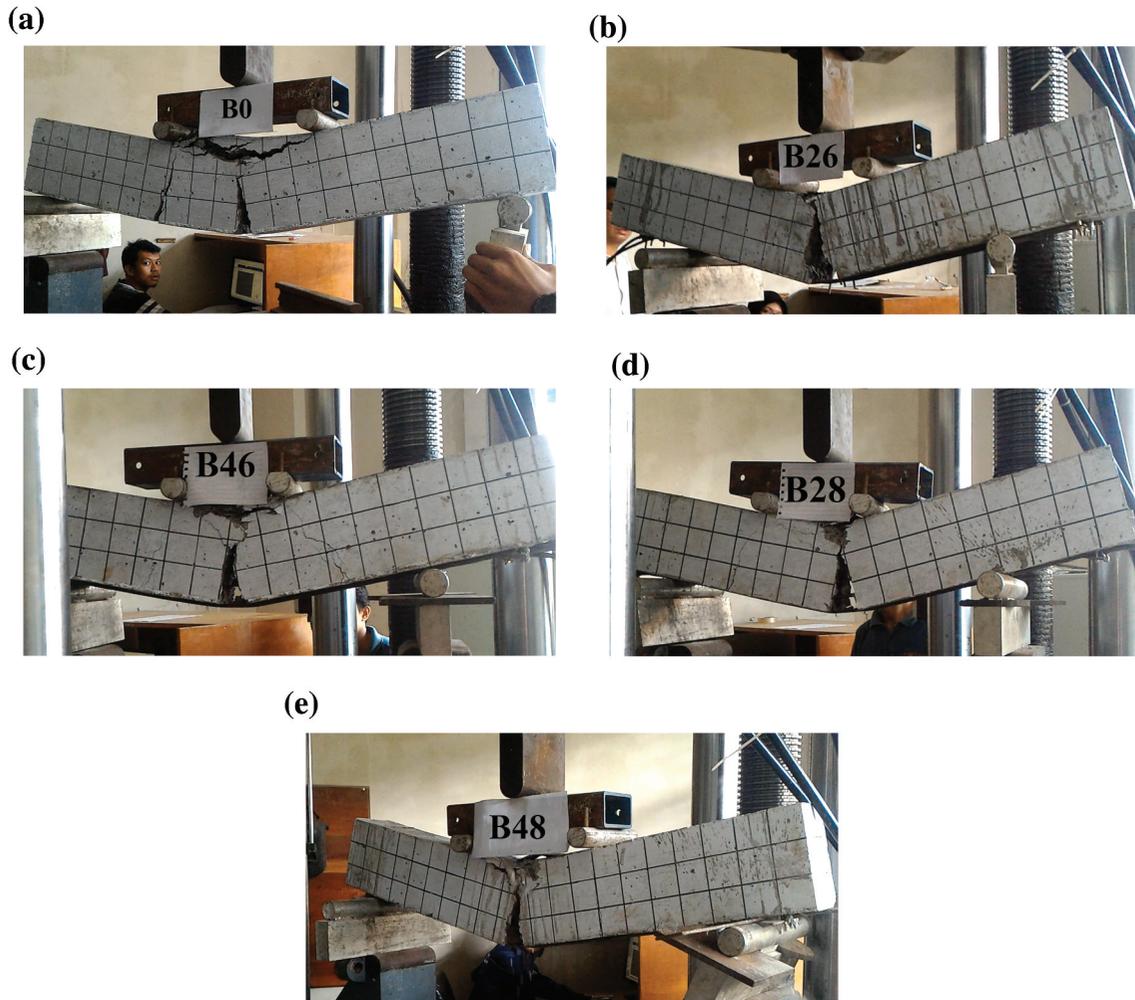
The failure mode of all tested specimens (a) Failure of B0; (b) Failure of B26; (c) Failure of B24; (d) Failure of B28; (e) Failure of B48.
